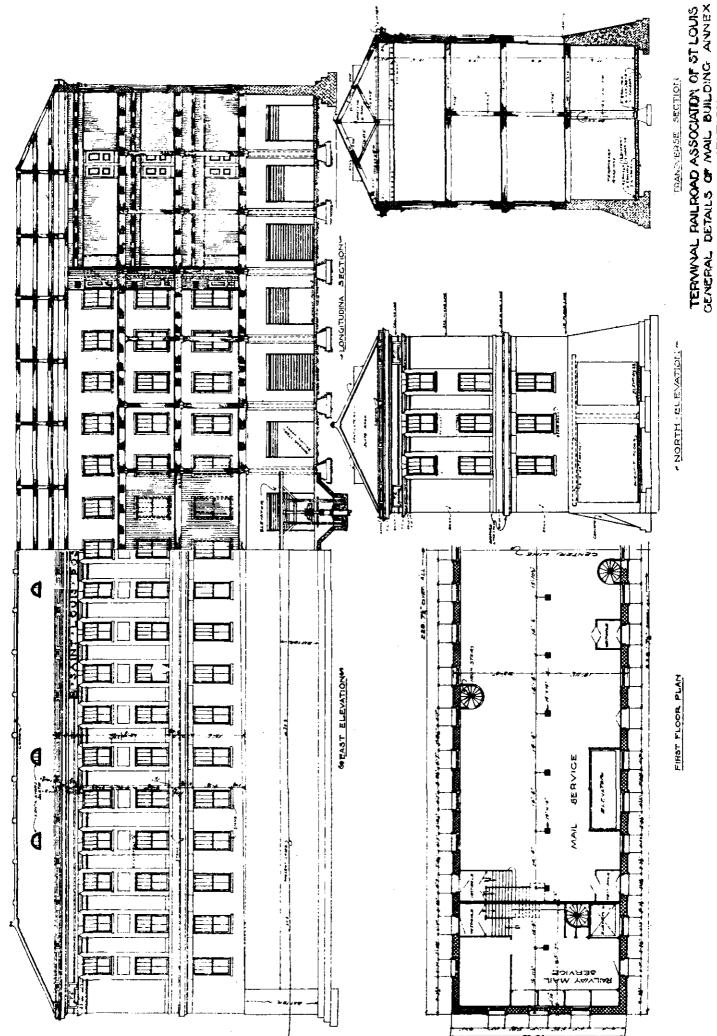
of 3 plan, section and elevation of Post Office Annex
